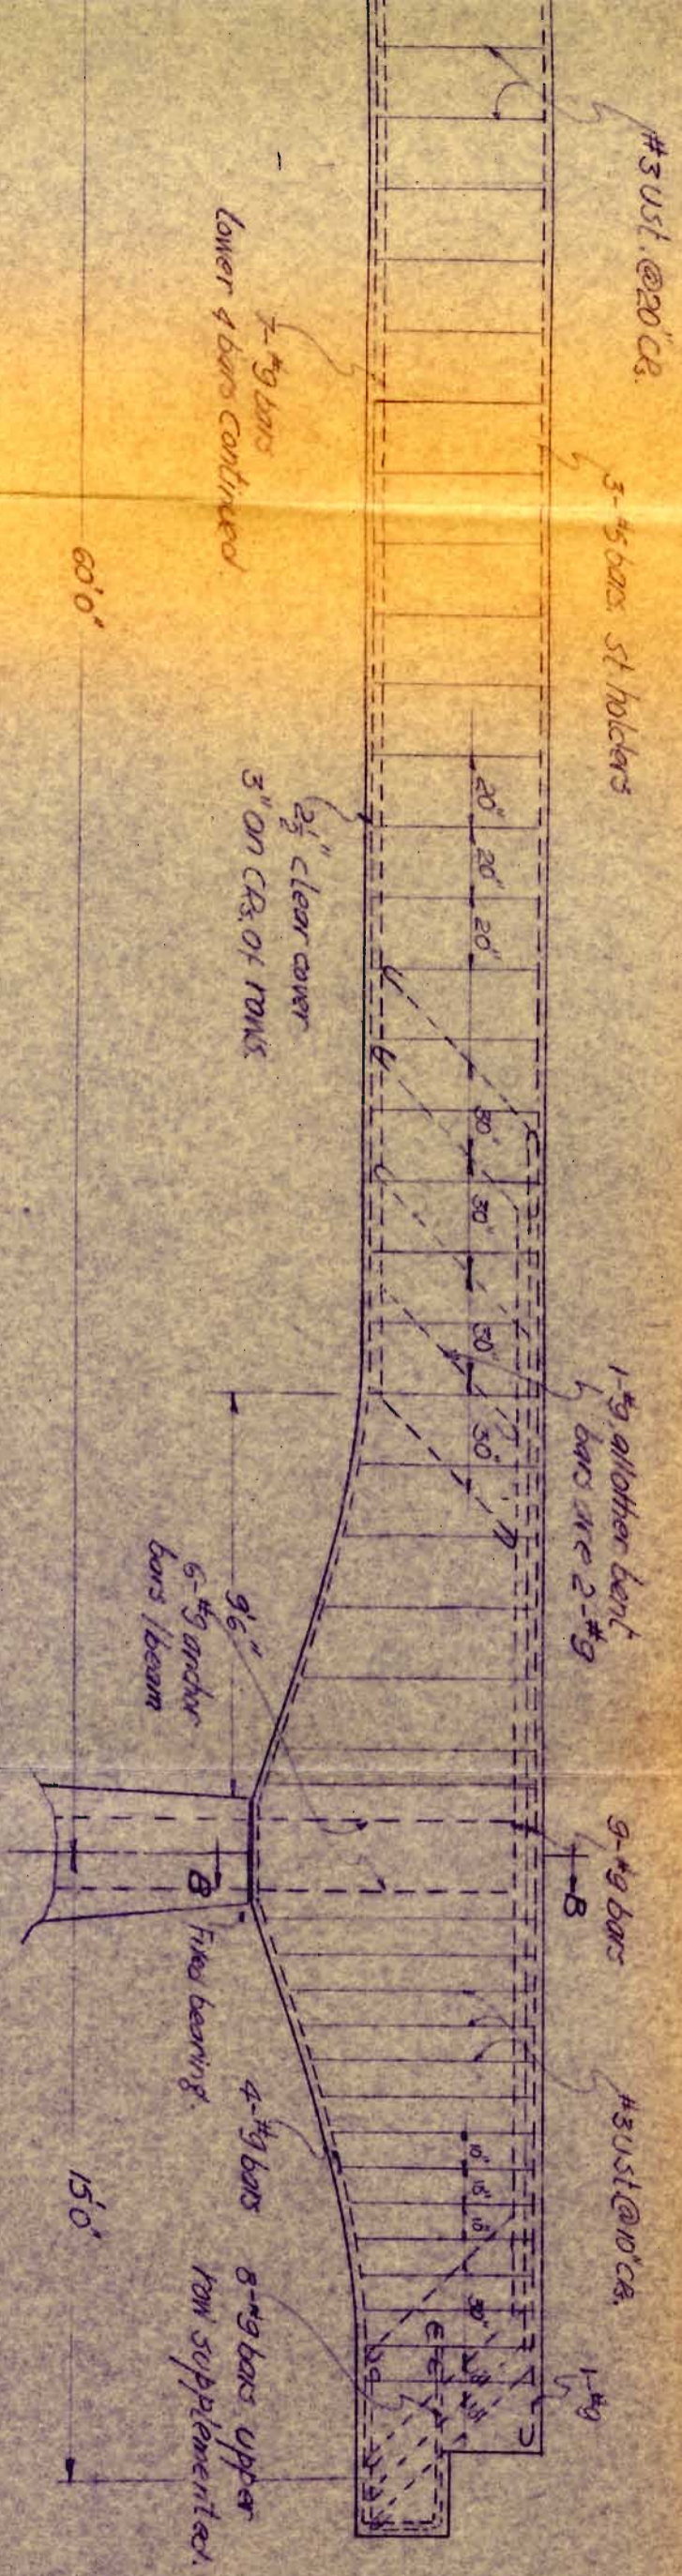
LONGITUDINAL SECTION THROUGH CANTILEVER AND END SPAN
